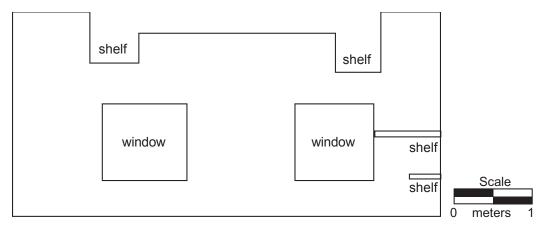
Elevation of southwest interior side of stone structure at Rancho El Saladito.
